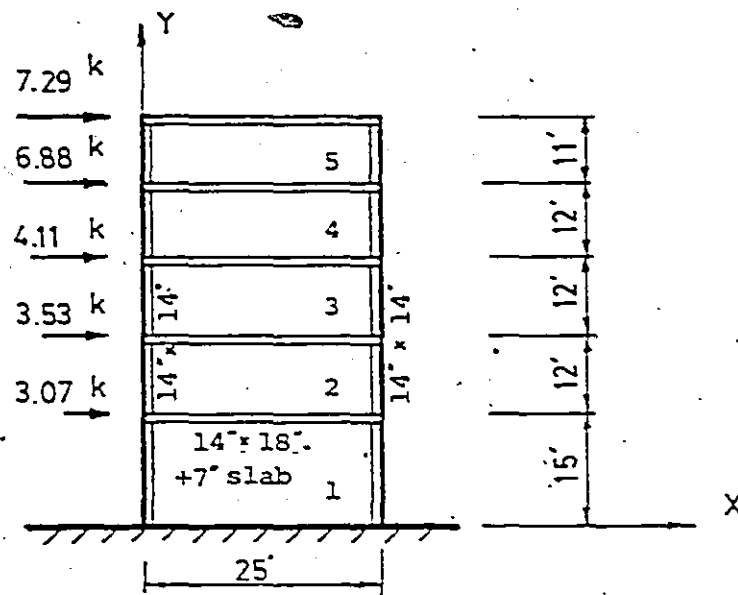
Testing Model 1 - R.C. Single Span Frame
